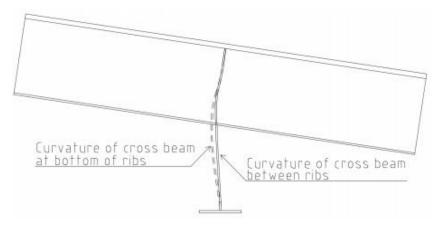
Structural system 5 (Håkansson & Wallerman, 2015)
